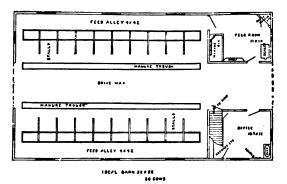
BARN FOR 20 MILCH COWS (GROUND FLOOR).
